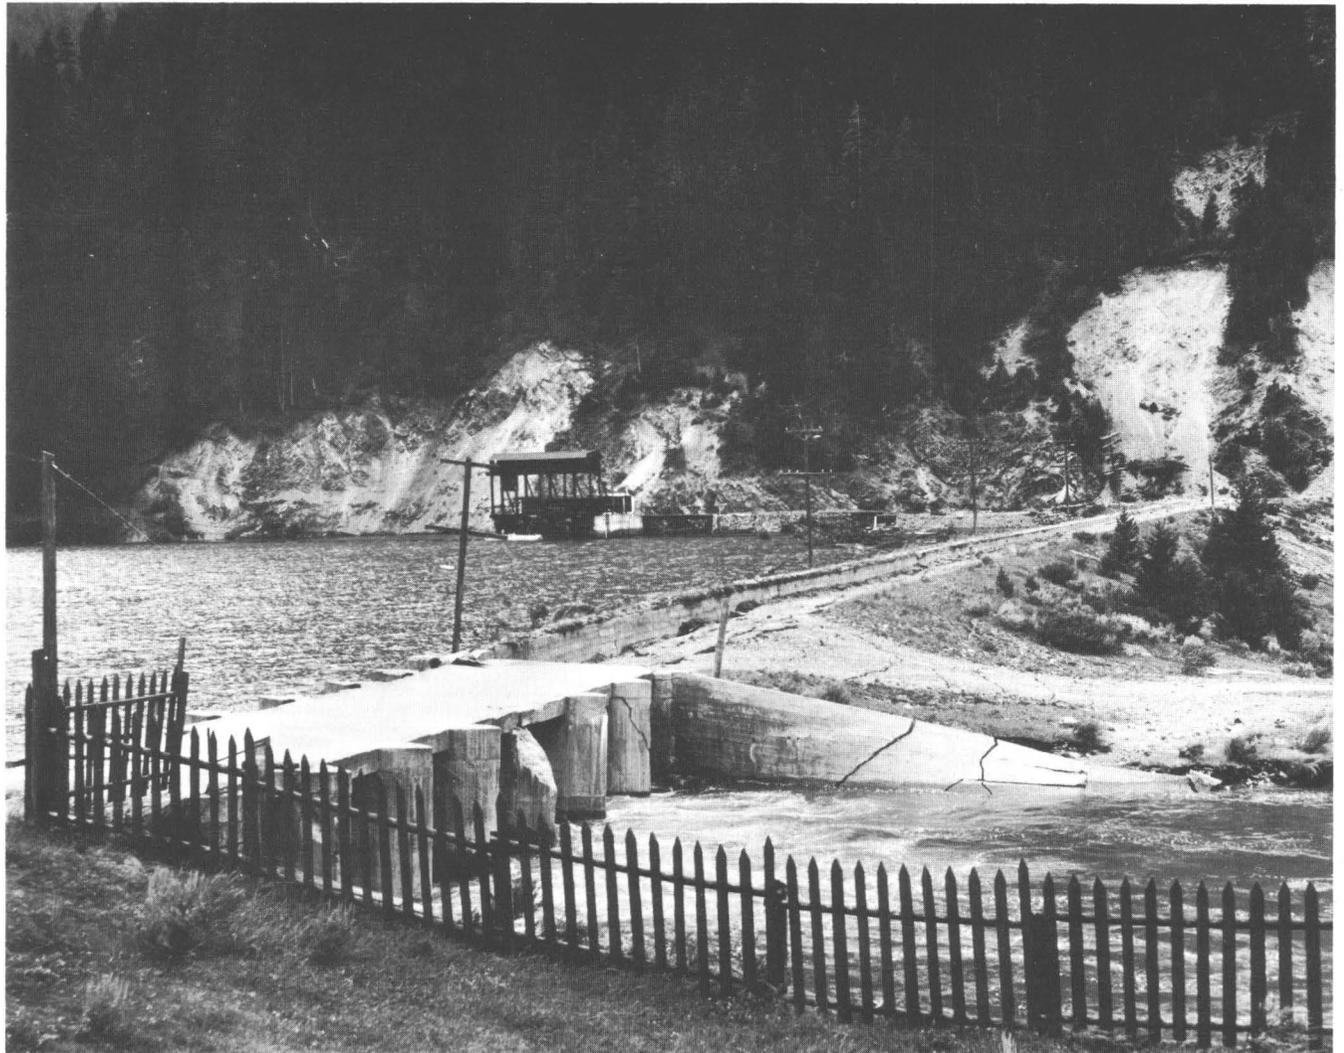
The crest of Hebgen Dam seen from the northeast abutment the day after the earthquake. Visible are the sunken downstream embankment, the bared core wall and its bent east end, and the broken spillway gates and cover. The structure at the opposite shore is the intake tower. Photograph by I. J. Witkind.
